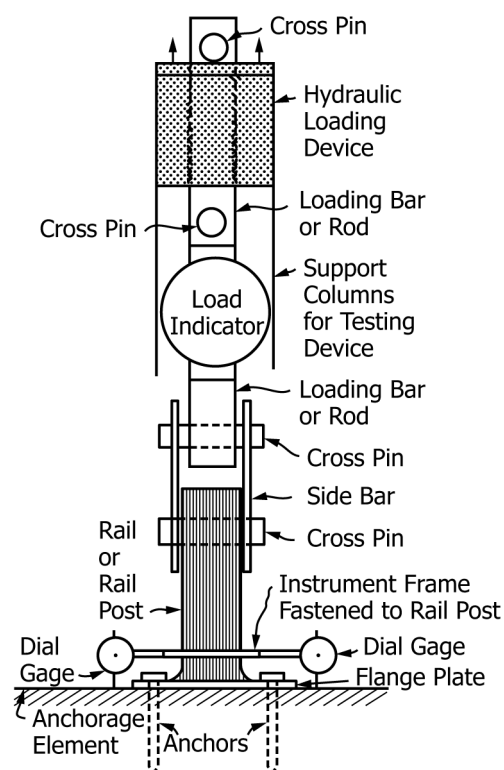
Diagrammatic Test Set-up for Applying Tensile Force to Rail, Rail Post, Flange Plate, and Flange-Plate Anchors with Field-testing Device
